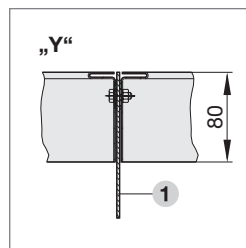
Special installation subframe for filter wall with flat steel stiffeners
